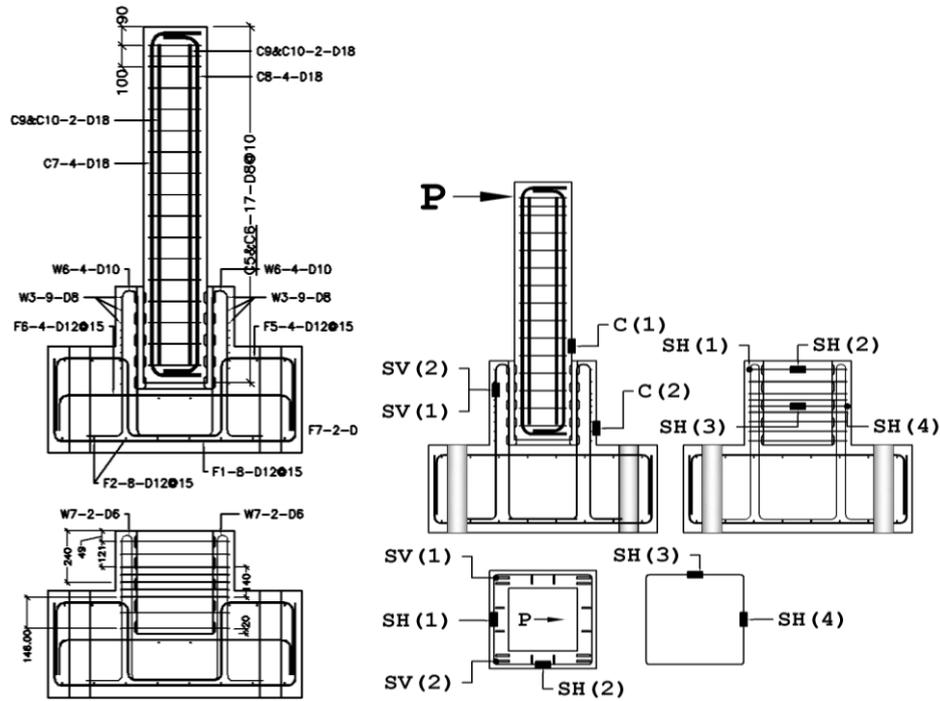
Specimens Reinforcement and Locations of Instrumentations
